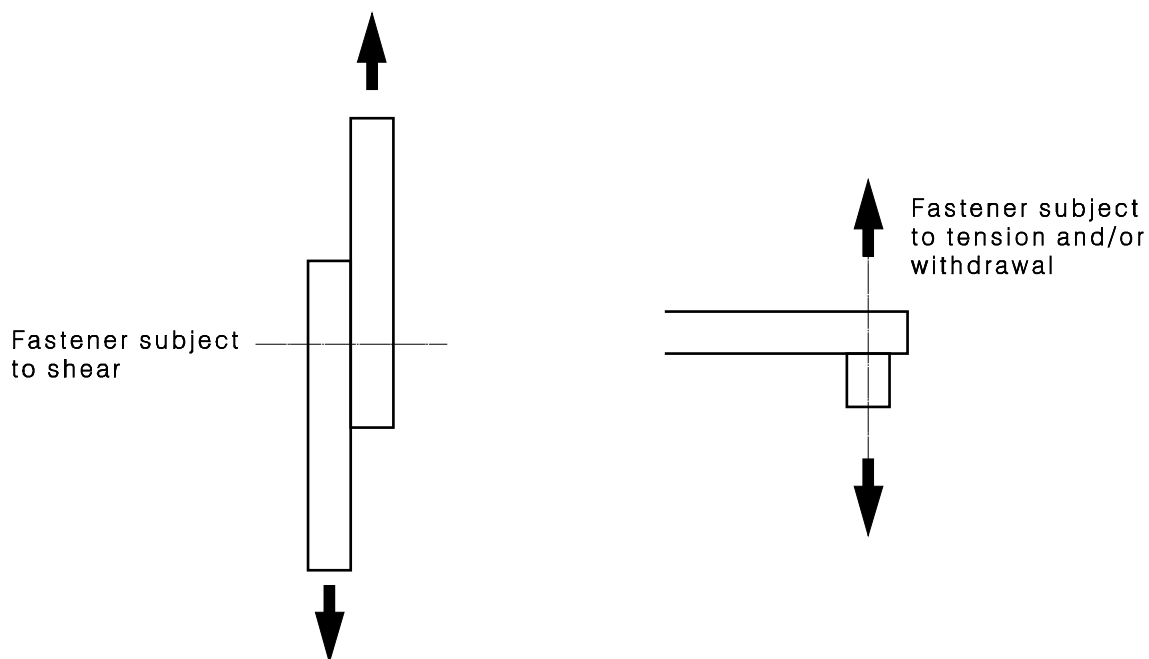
Left: Fastener subject to shear (Type 1); Right: Fastener subject to Tension (Type 2)
